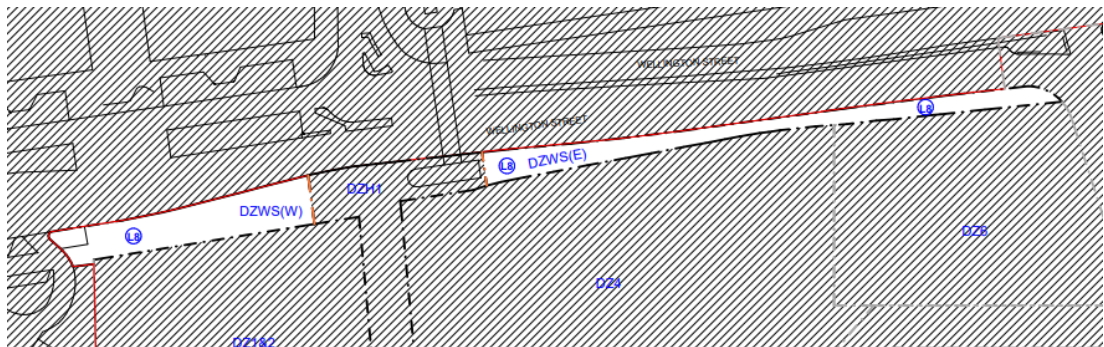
DZWS(E) & DZWS(W) Parameters Plan
